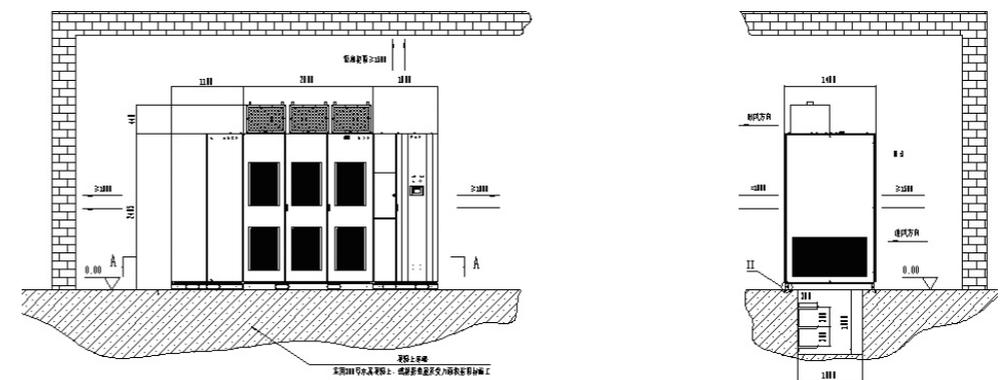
Drawing of FGSVG-C4.0/10 Installation Foundation
